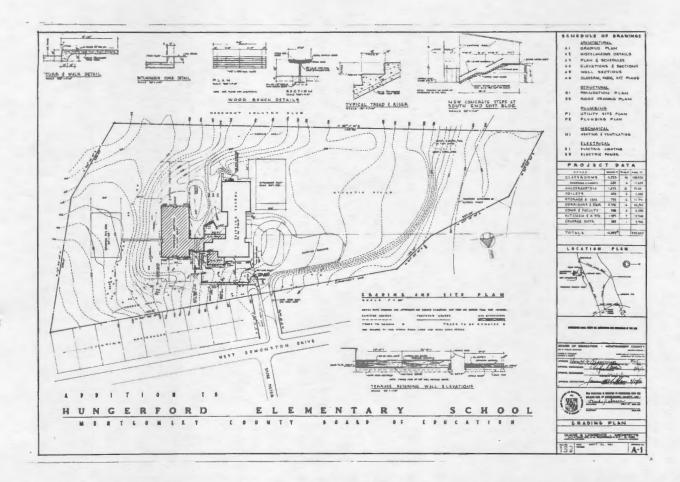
1961 site plan prepared by Duane & Lawrence, showing proposed addition relative to original 1960 building (Montgomery County Public Schools).
